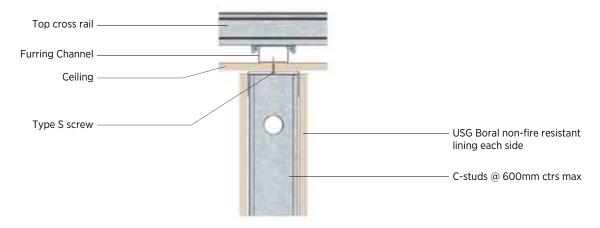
Wall Head Fixing to Suspended Ceiling Detail - Parallel to Furring
